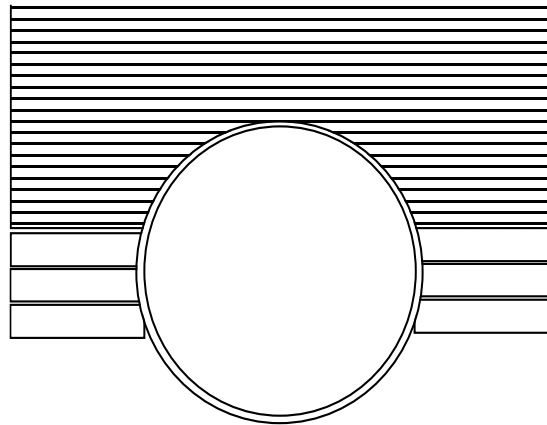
Tub on perimeter of deck with stairs on each side. This arrangement allows for plumbing to be hidden under the deck and for most of the tub to be seen. Good choice for any heating system.
